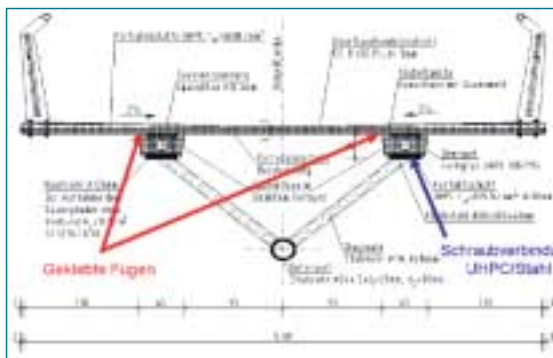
Cross-section of the Gärtnerplatz Bridge.
